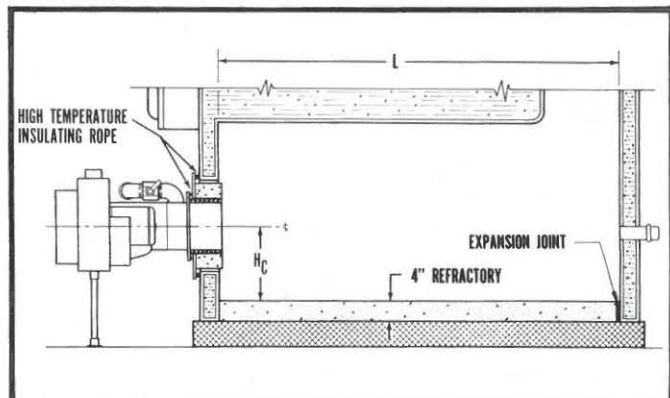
TYPE "FL" BURNER INSTALLATION FIRING FORCED DRAFT BOILER
